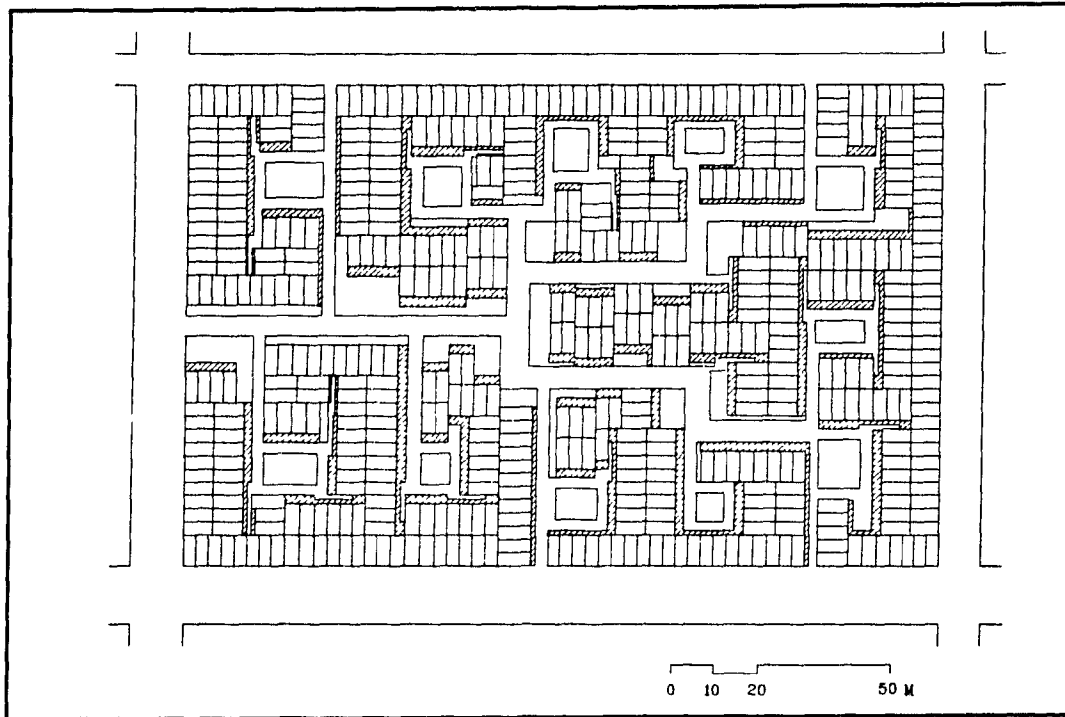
HOUSE EXTENSIONS - ALTERNATIVE # 1
